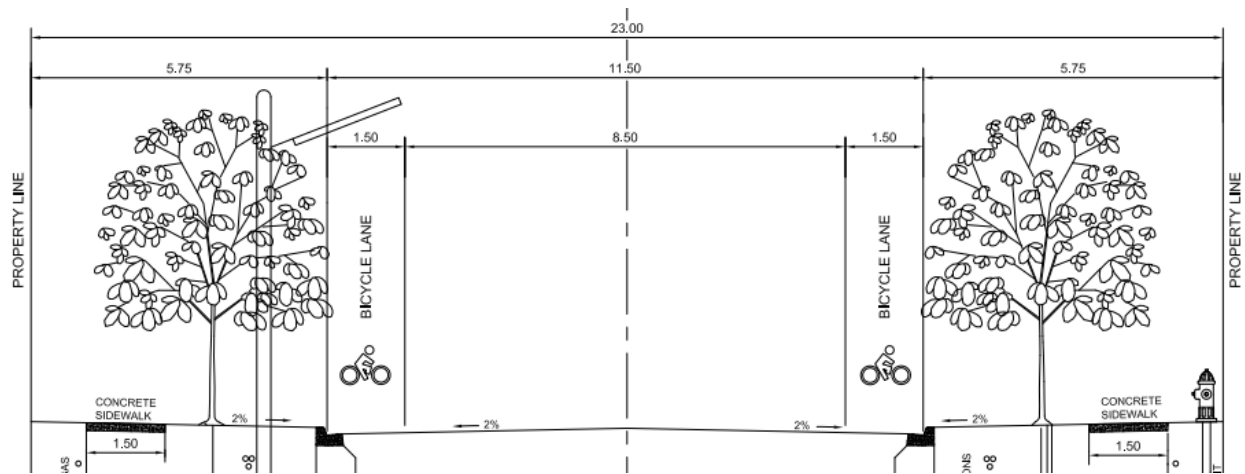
Typical 23.00 metre right of way (with bicycle lanes) cross-section
